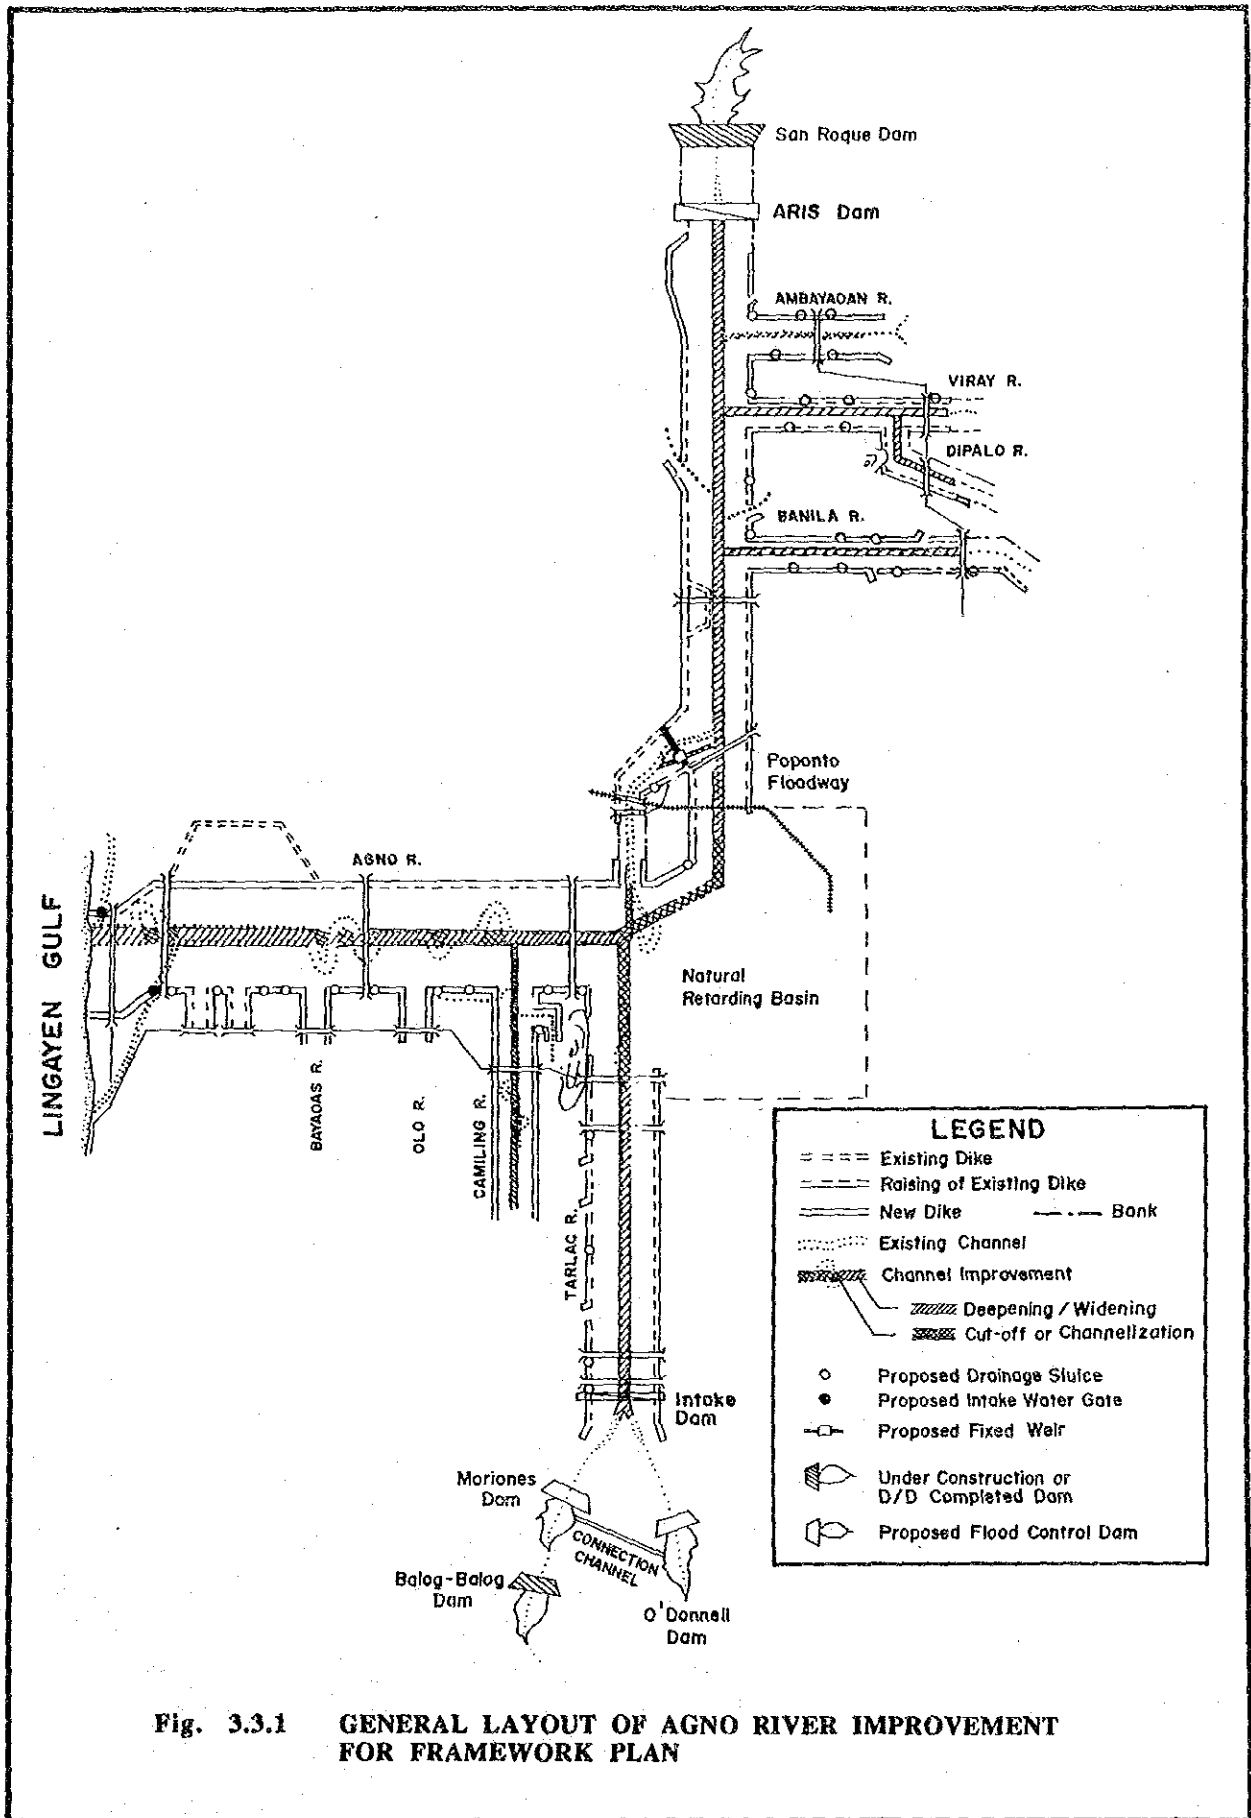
GENERAL LAYOUT OF AGNO RIVER IMPROVEMENT FOR FRAMEWORK PLAN
